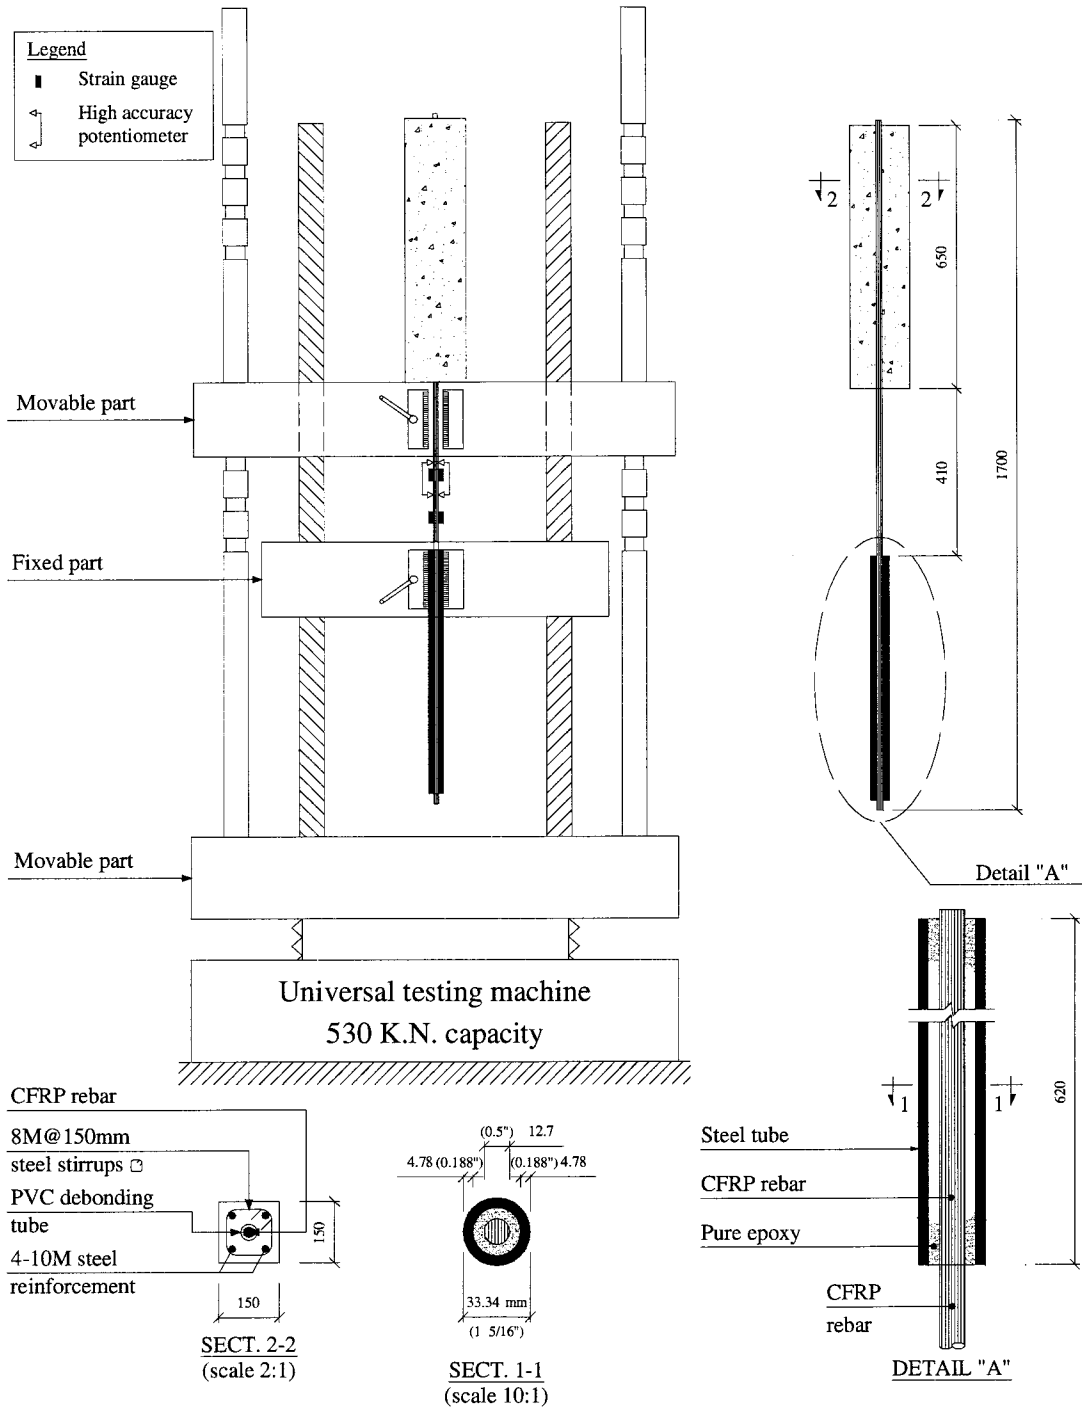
Concrete dimensions, reinforcement details, test setup, and instrumentation of pullout test
